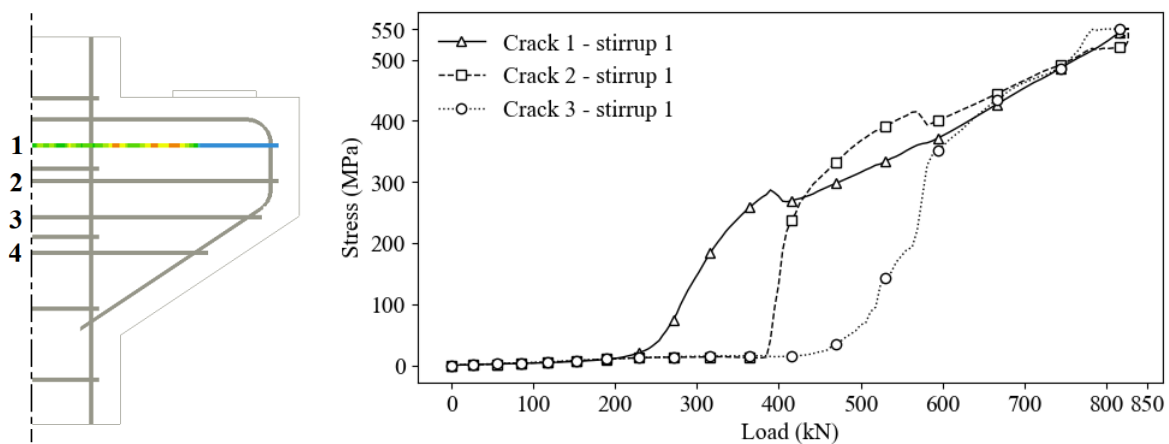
Development of stresses in stirrup 1 up to failure.
